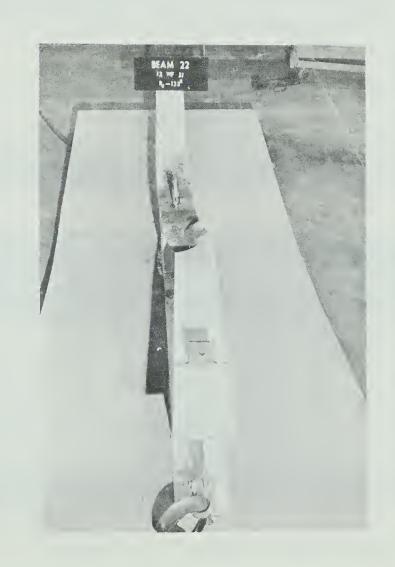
TYPICAL APPEARANCE AT FAILURE
